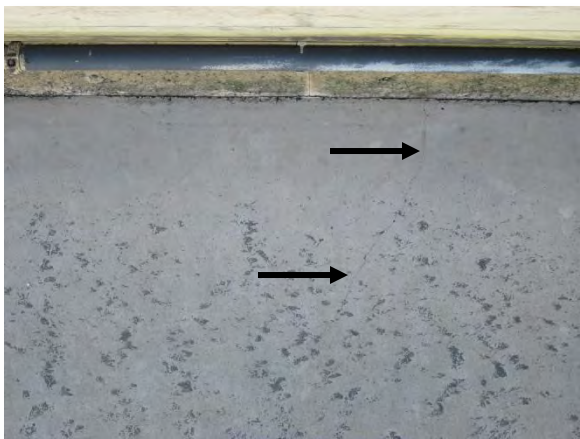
Crack in floor near east wall (north is to left in photo).
